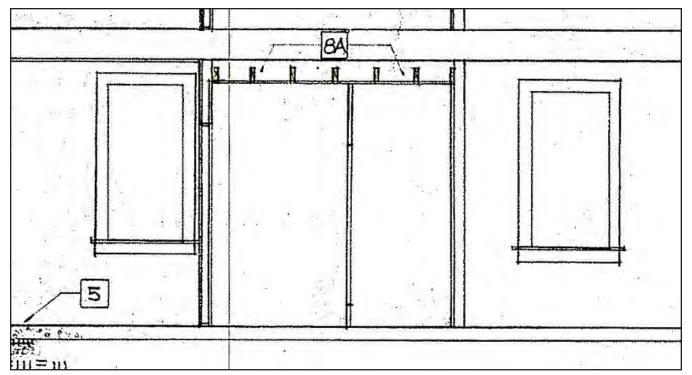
C-5: 1980s Building section showing addition of 2x4 ceiling joists above bathrooms
